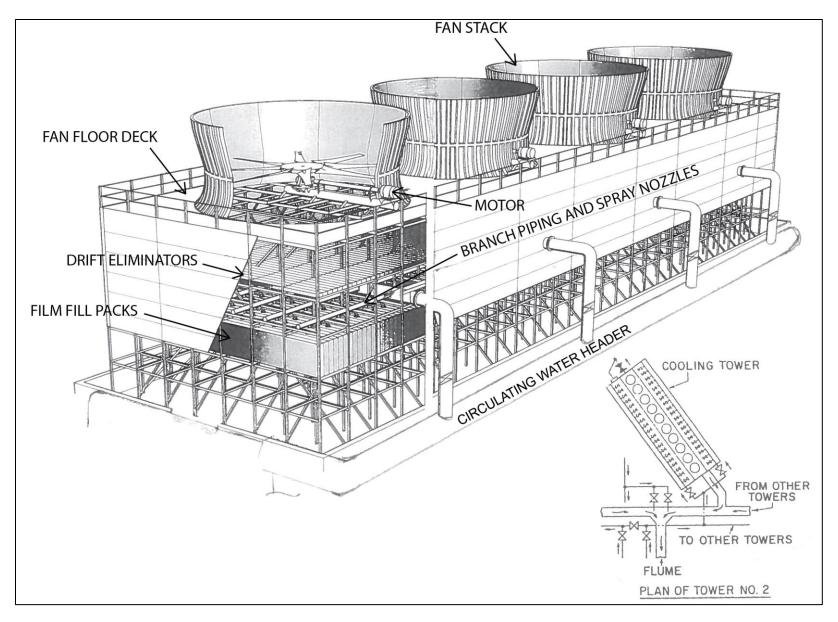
Schematic of Clinch River Plant Cooling Tower
